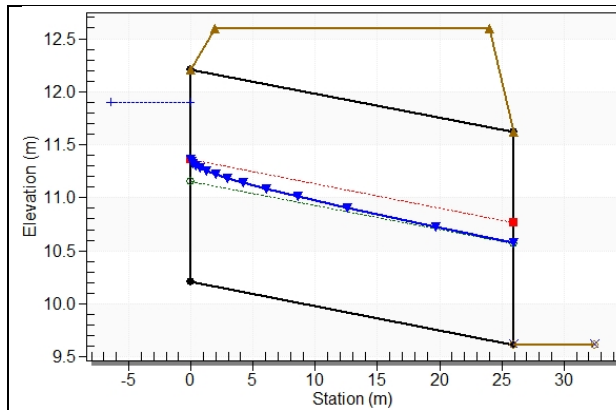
Water surface profile for culvert during 1:10yr rainfall event using one (1) 2m culvert pipe.
